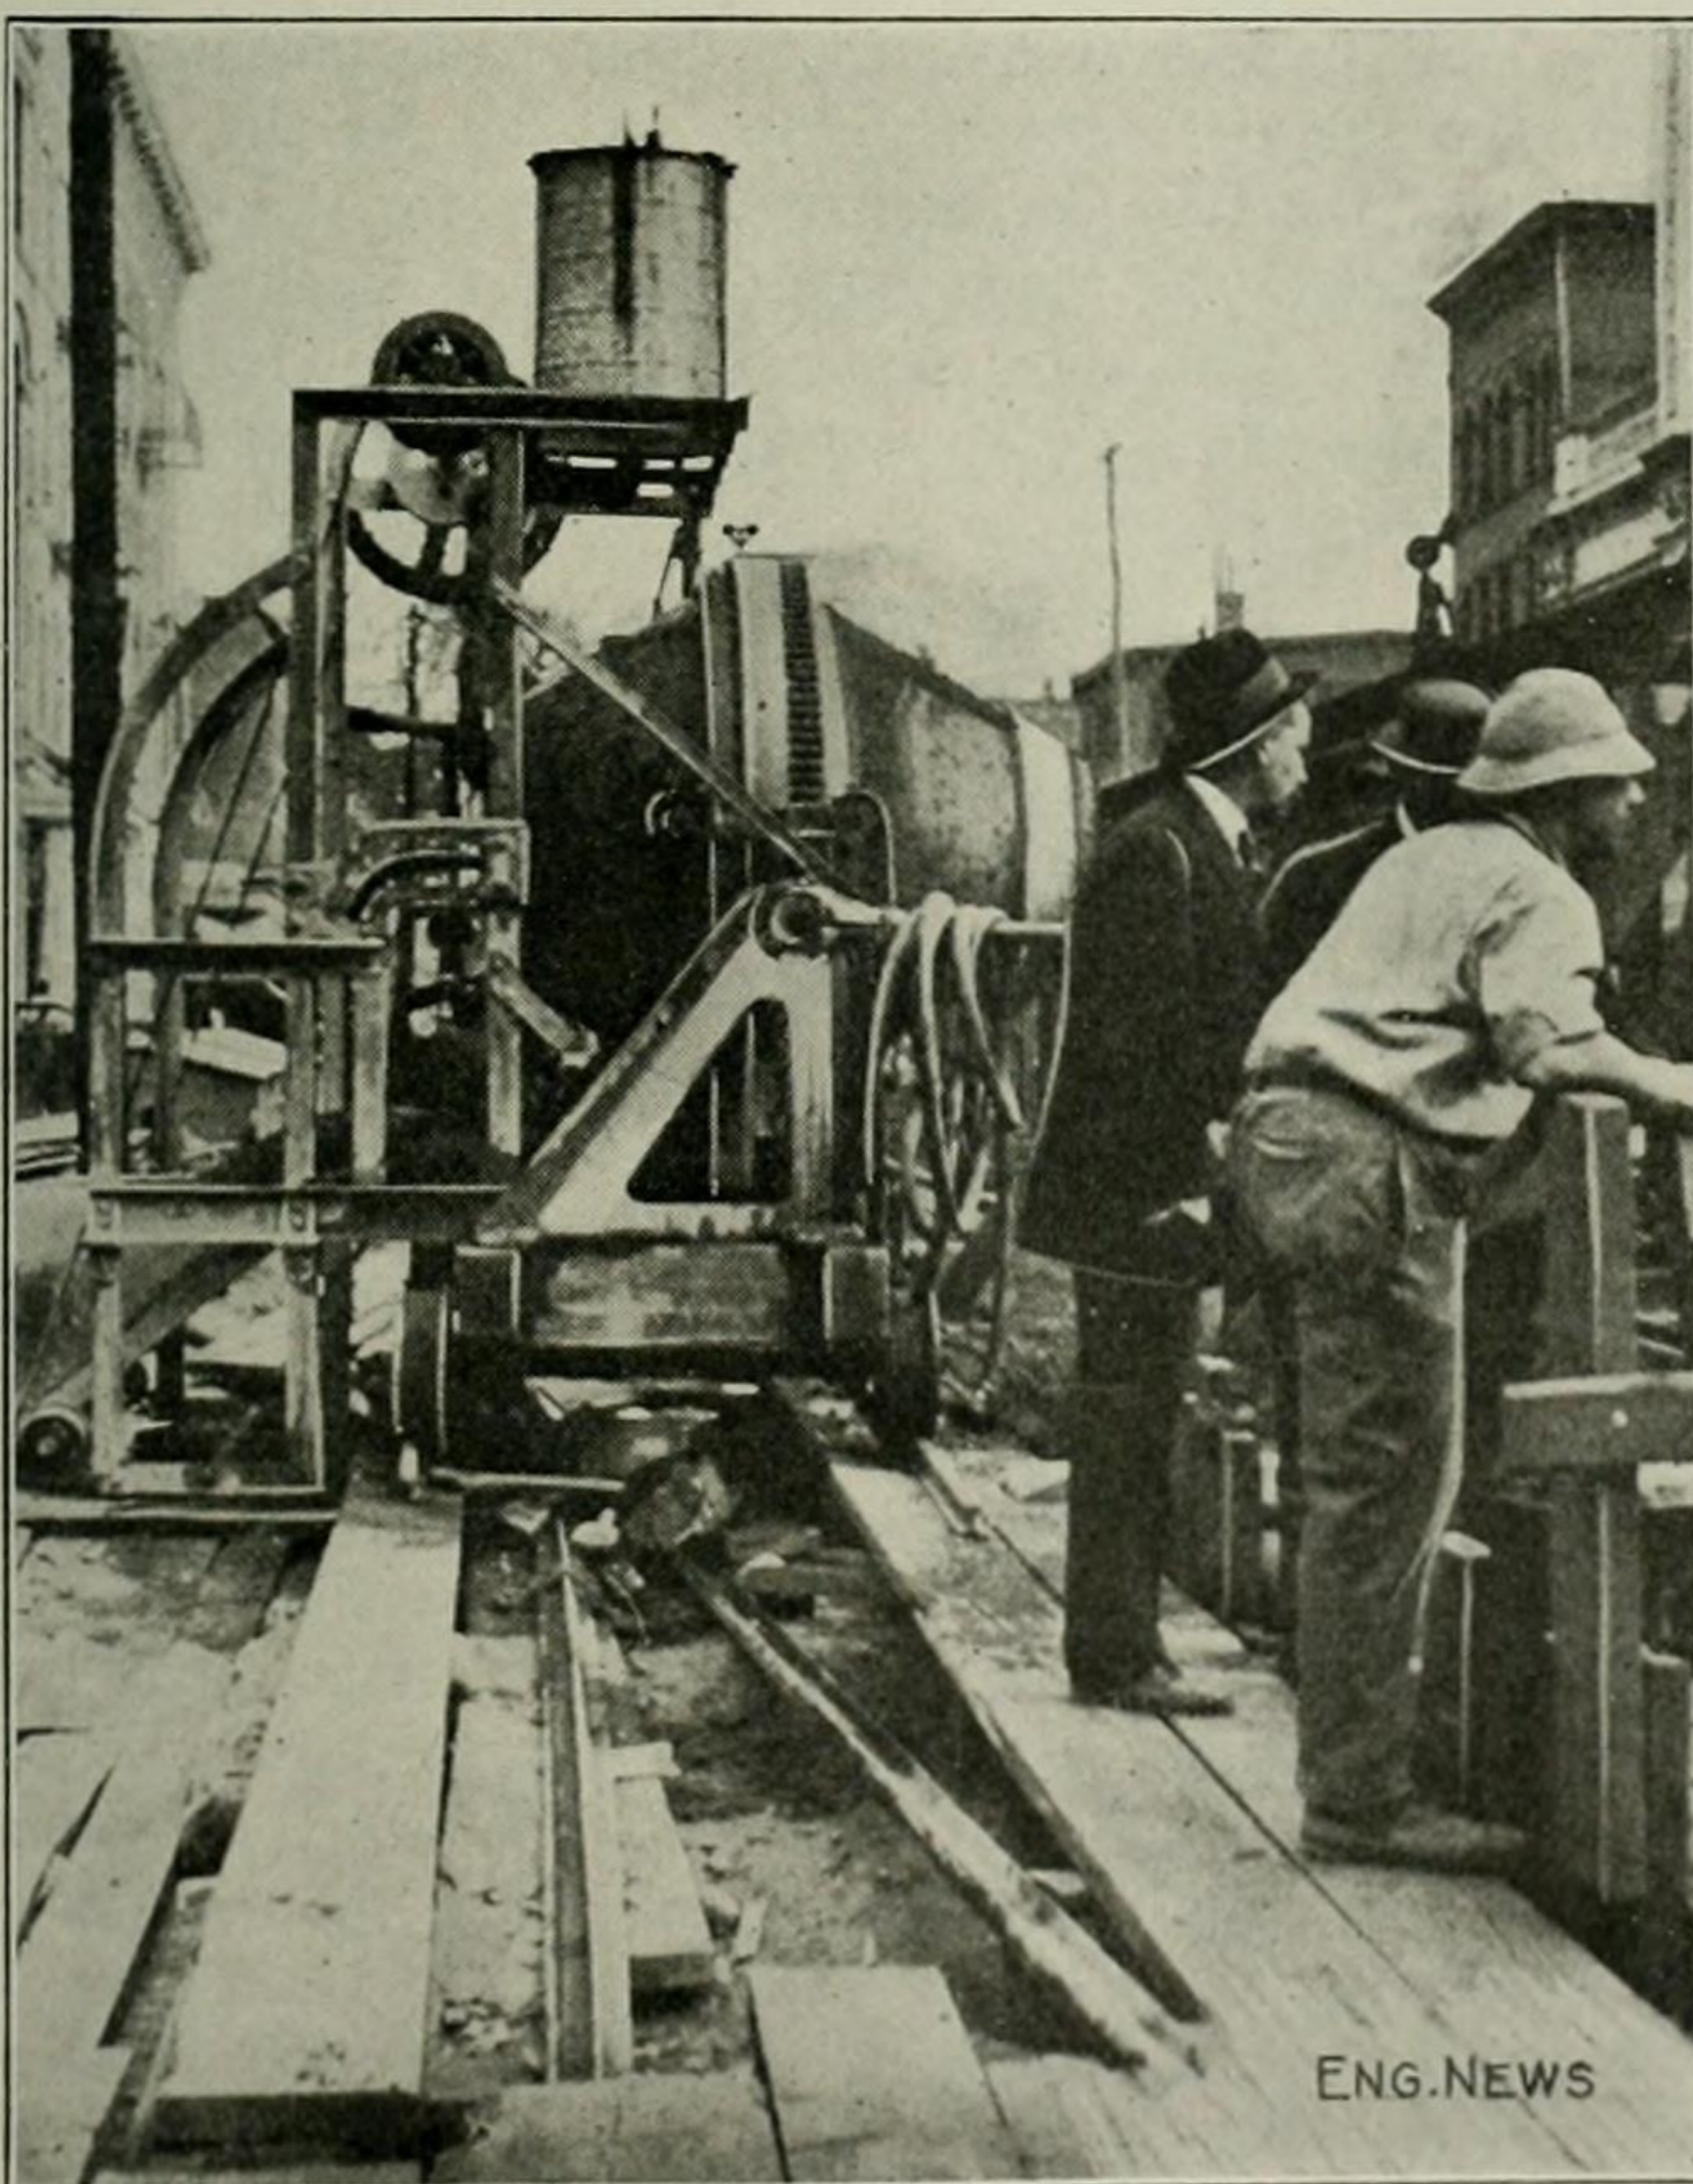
TRAVELING CONCRETE MIXER, TOMPKINS AVE. SEWER
